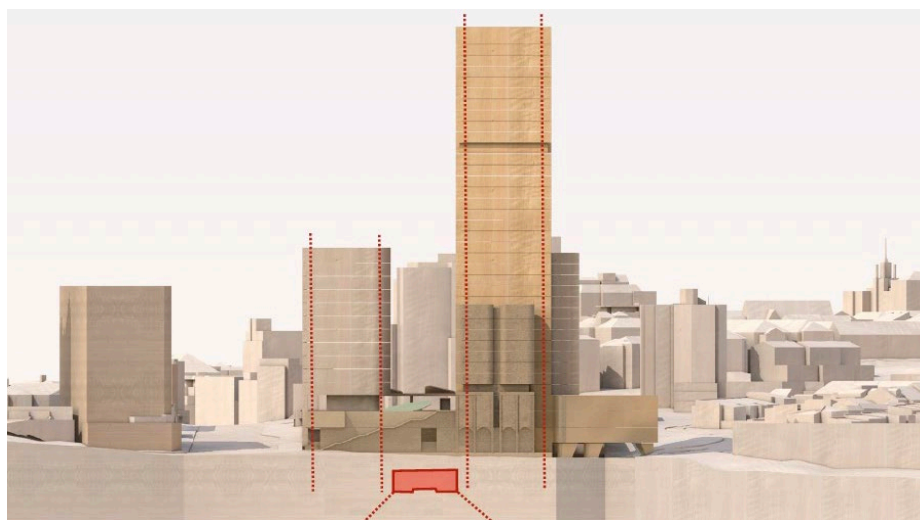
Indicative development concept – tower positioning around rail corridor (Source: FJC 2024)
